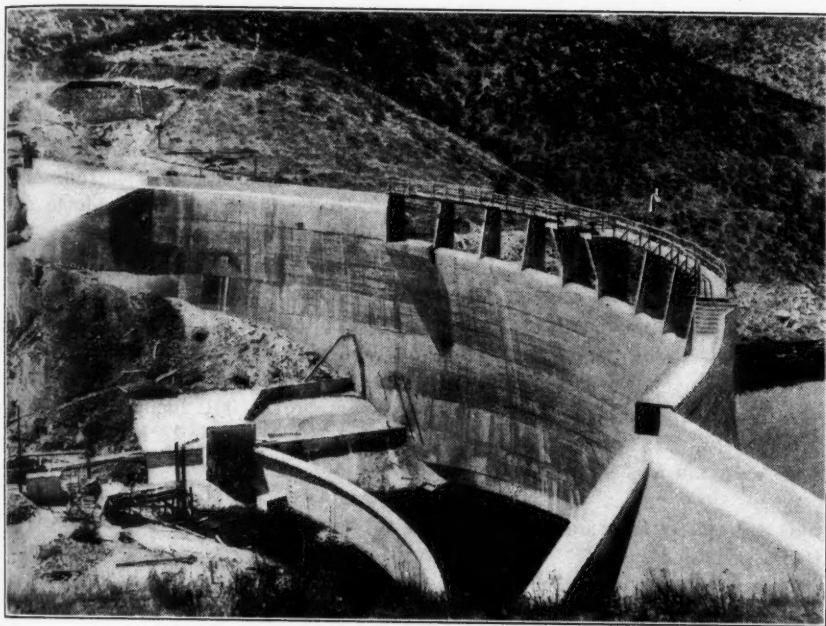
DOWN-STREAM FACE, RAILROAD CANYON DAM.
